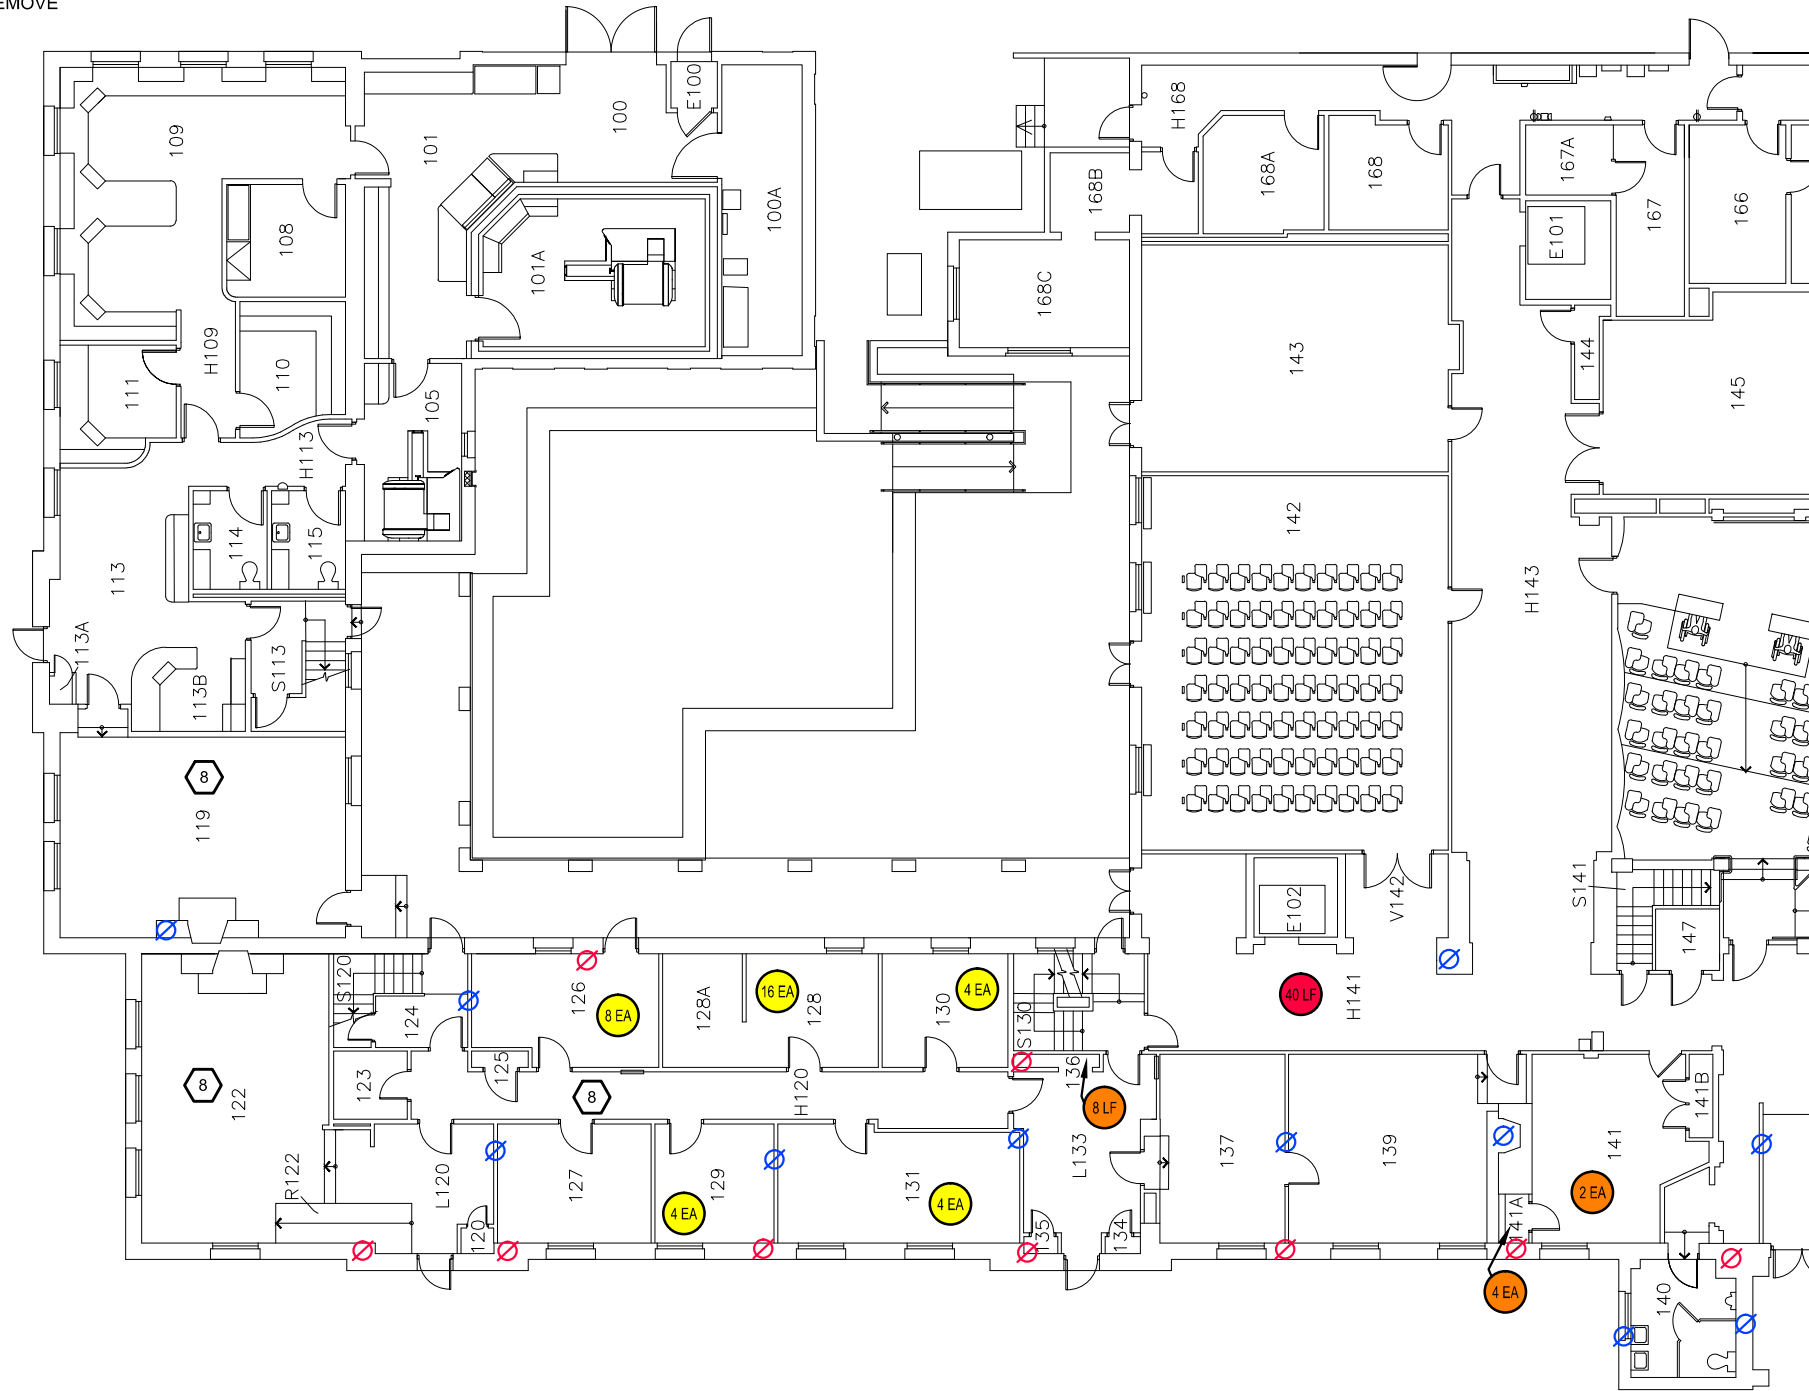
STRAUB HALL - FIRST FLOOR - NORTH HALF
